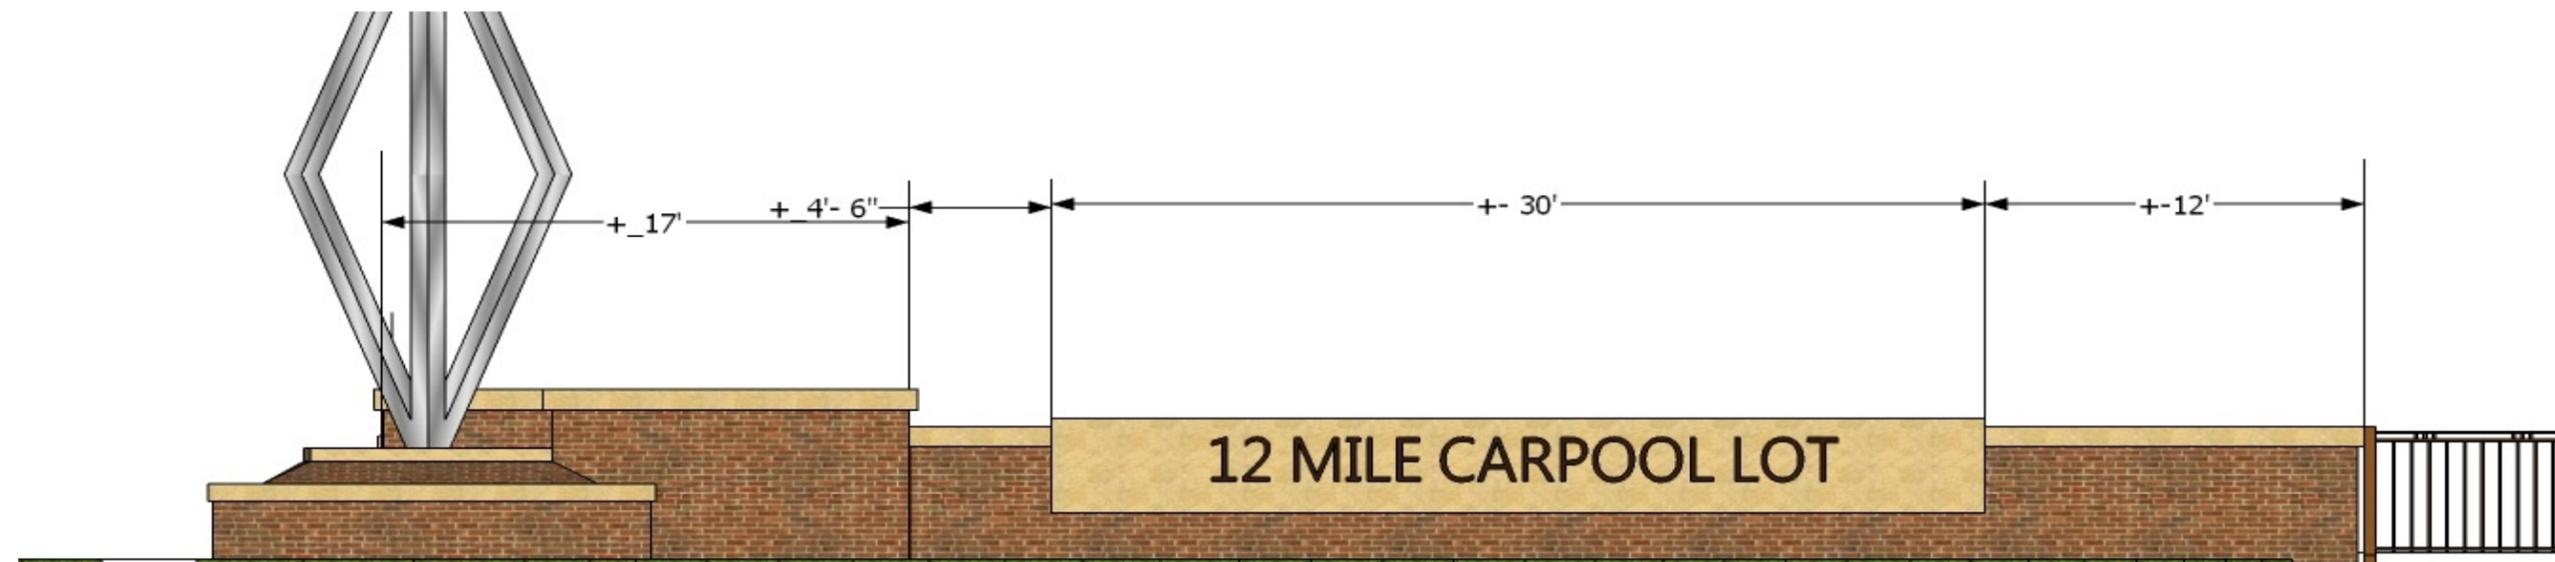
Carpool Lot Walls with Stone Veneer, Smooth Concrete Caps, and Steel Sculpture Painted with Accent Color
